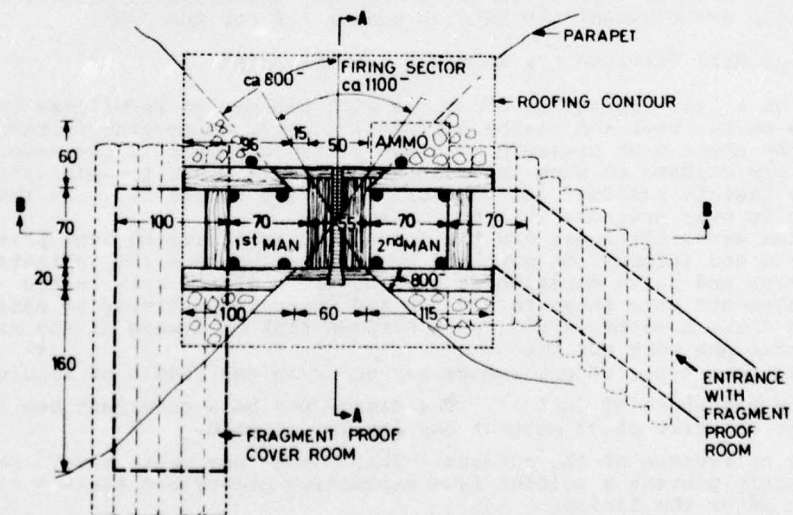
Plan view of the 84 mm RCR Carl Gustaf bunker
